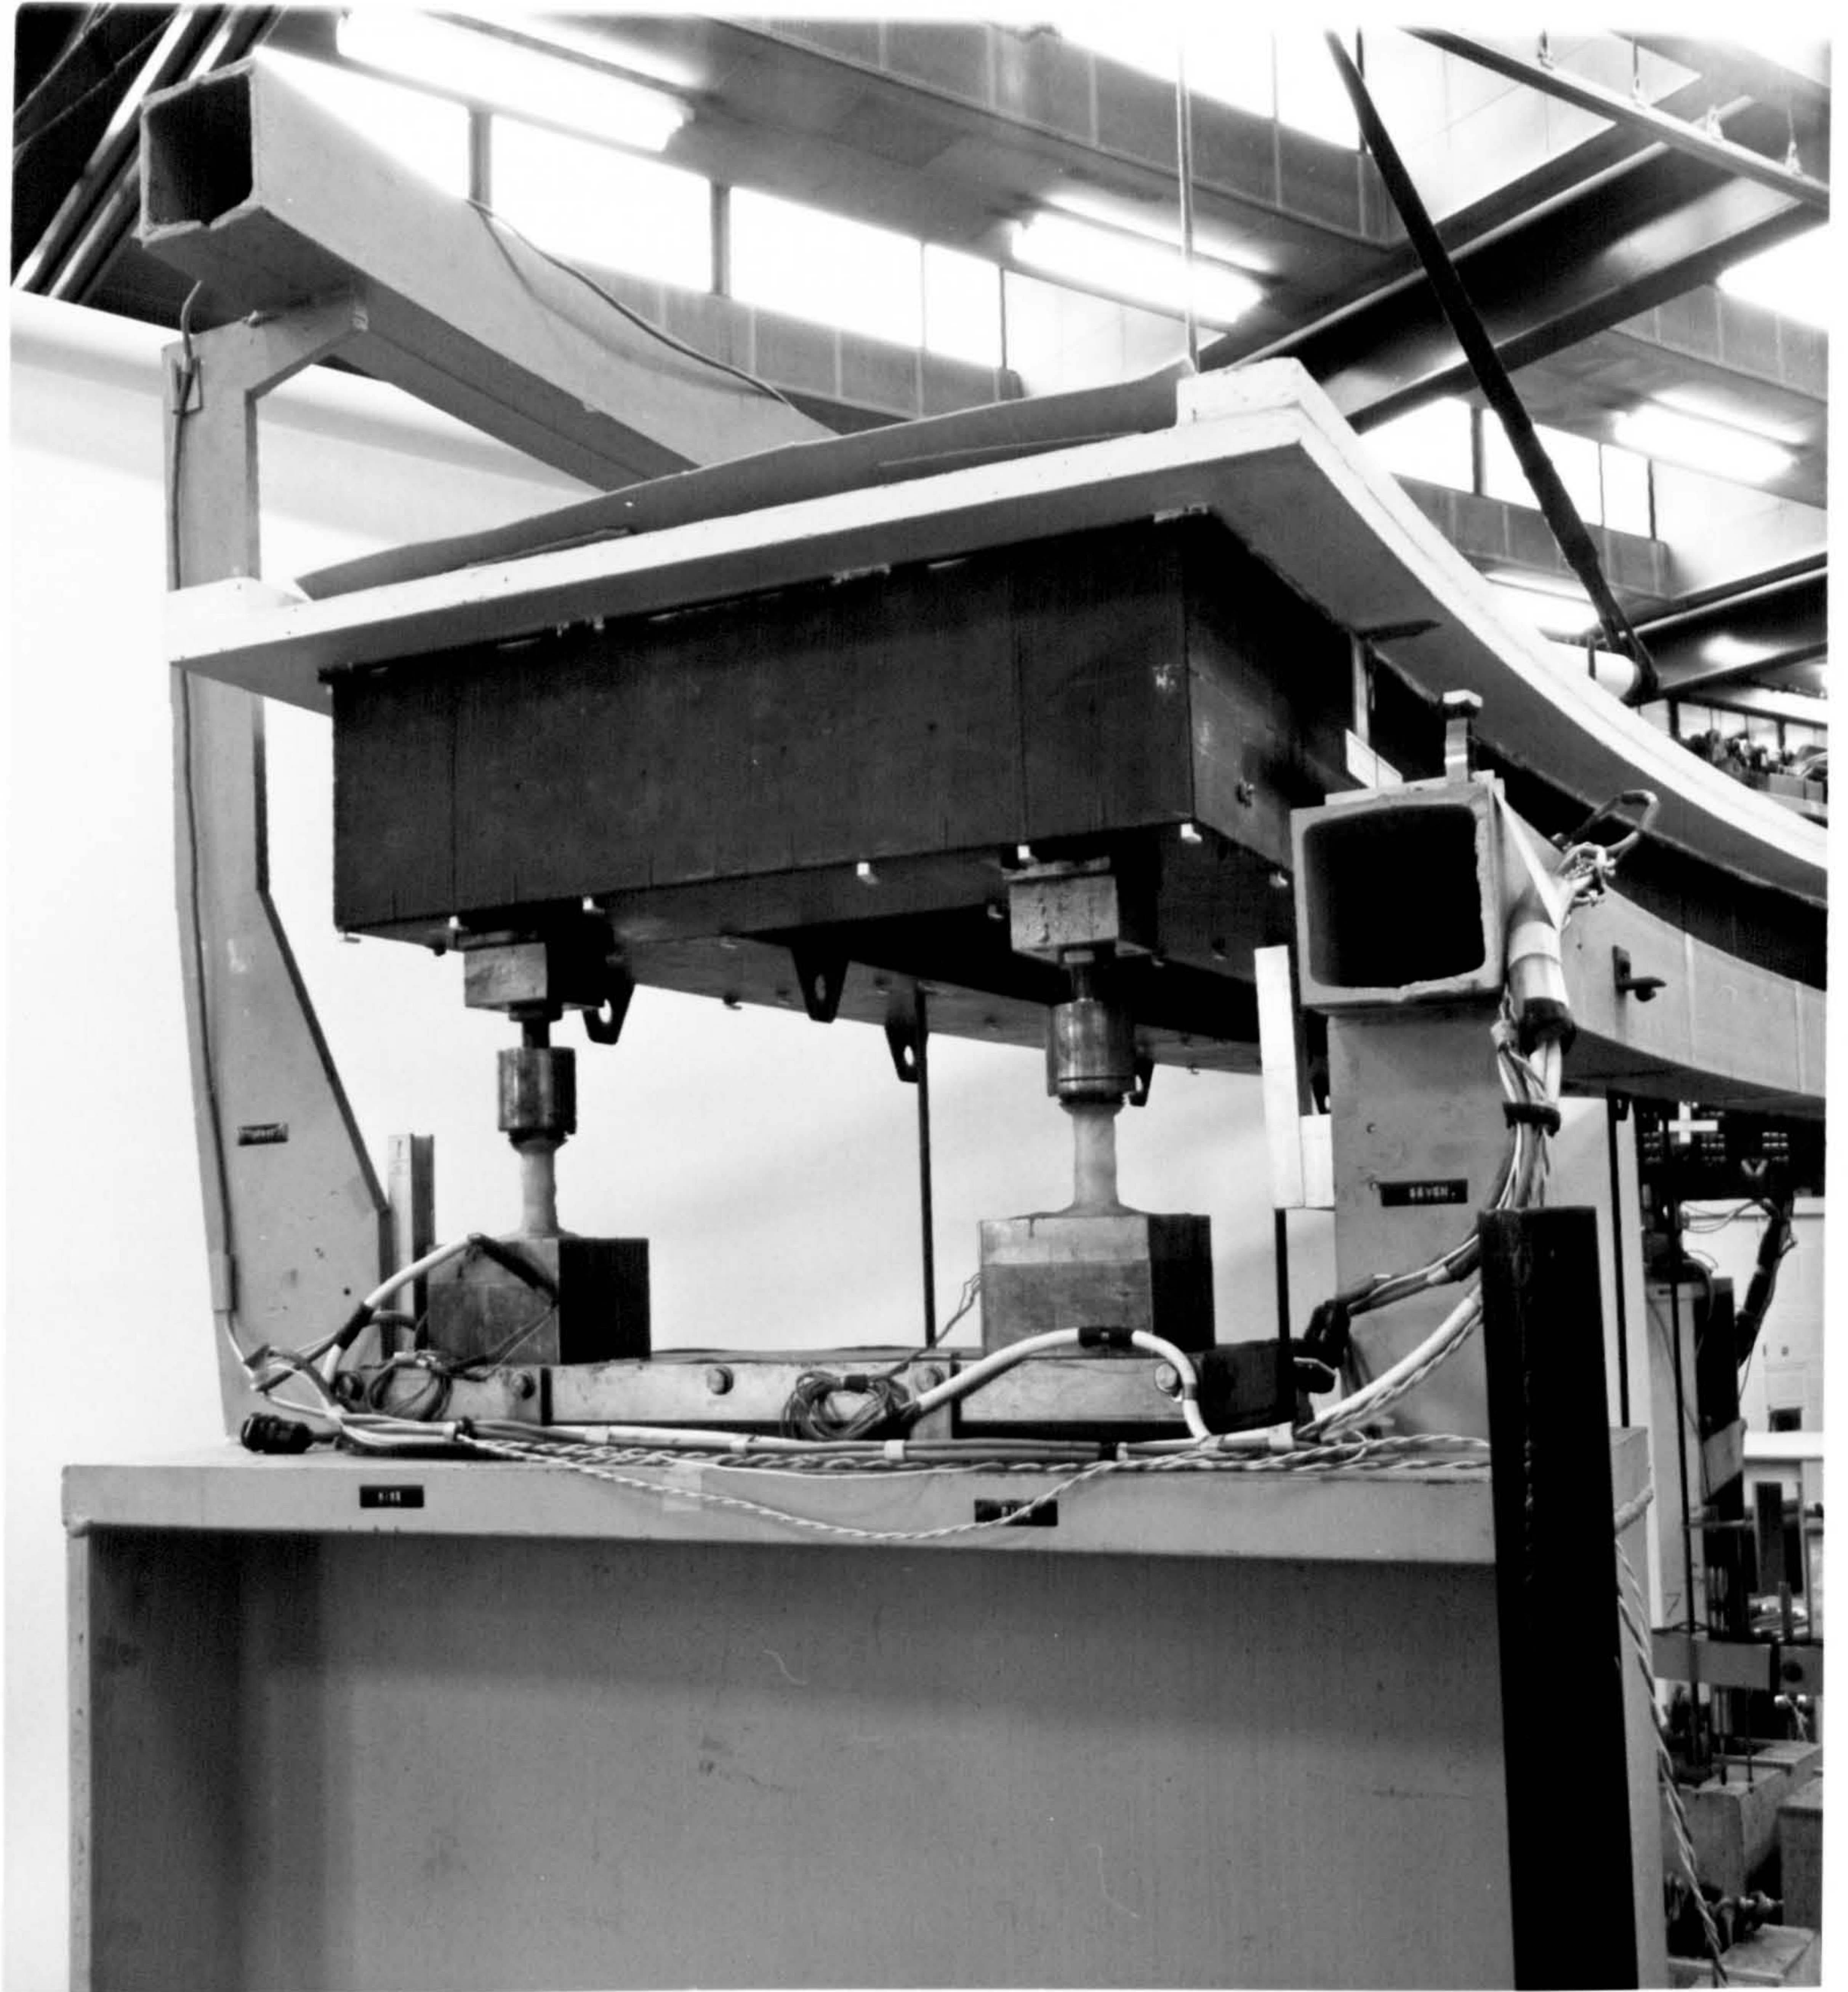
One of the bridge support columns with the longitudinal deflection beams. A right-angled plumbwire support bracket can be seen on the right-hand beam.
